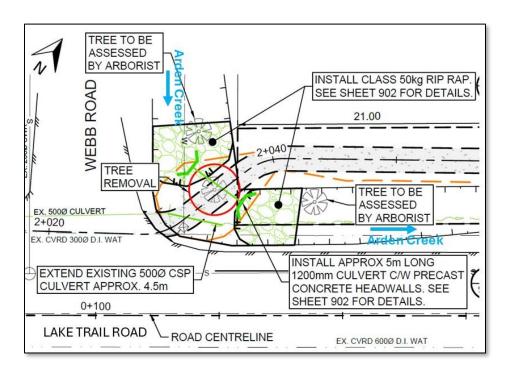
Project activities proposed at the corner of Webb Road and Lake Trail Road including culvert installation and extension in Arden Creek, and tree removal
